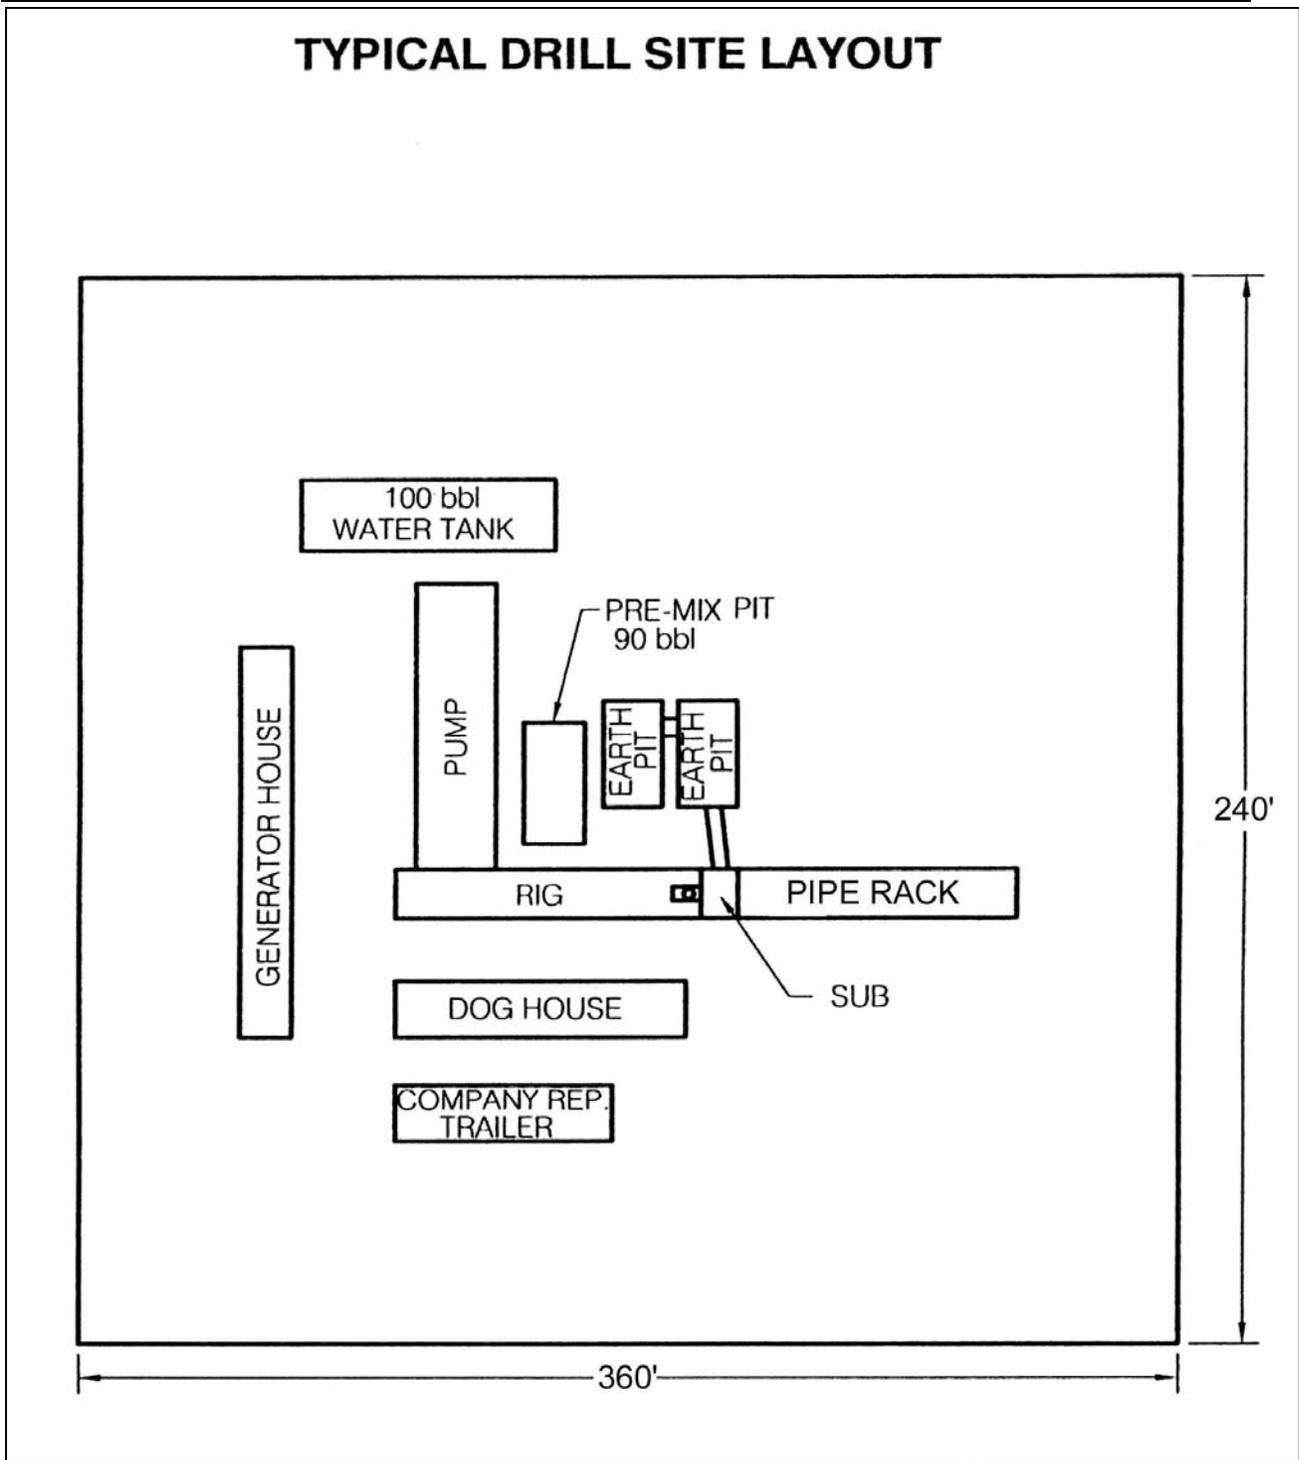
Typical Drill Site Layout – Atlantic Rim Natural Gas Project
